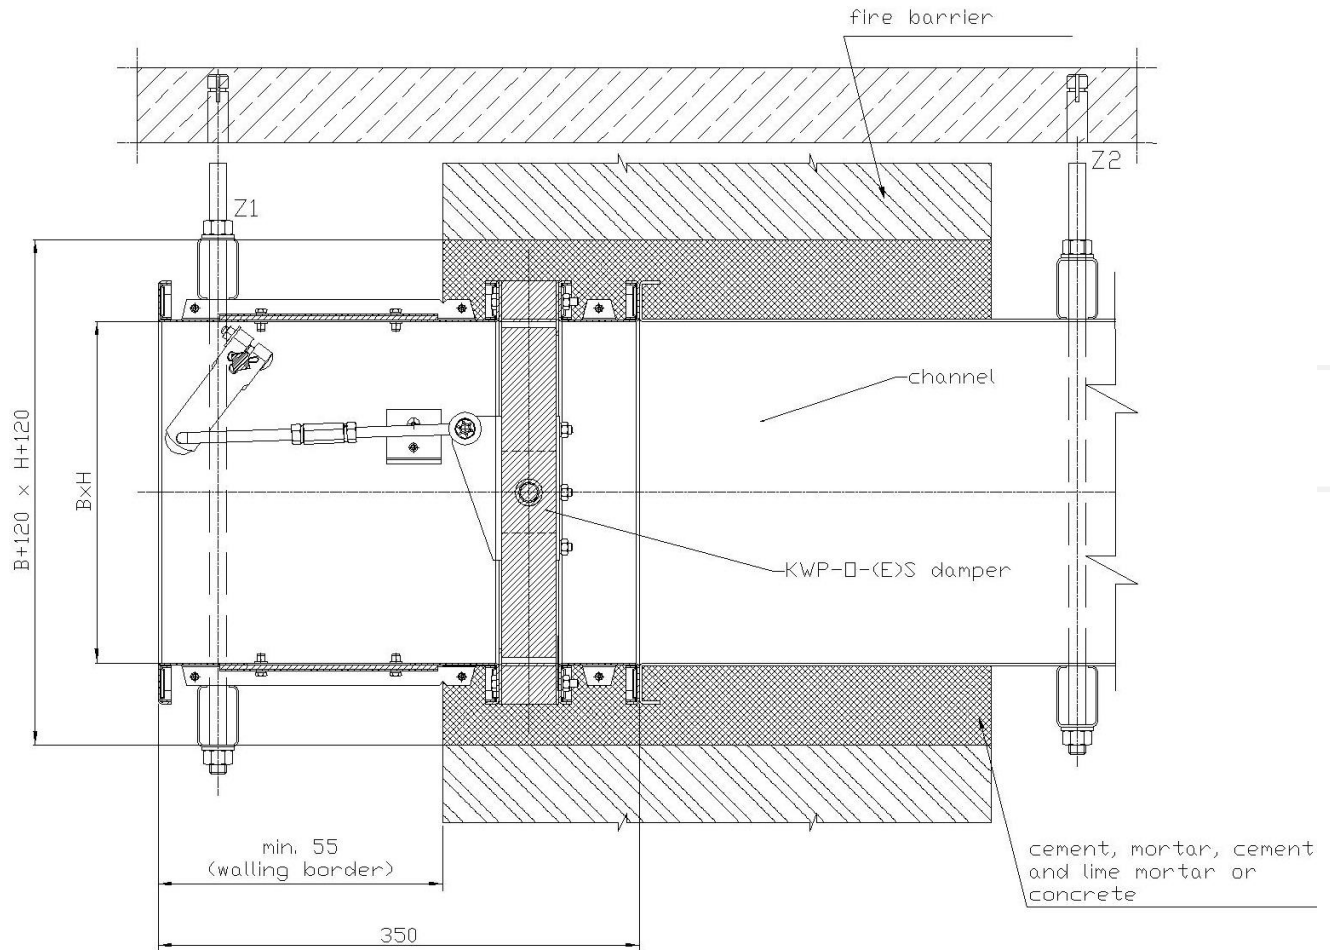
Installation method of fire dampers in structures thicker than 135 mm
